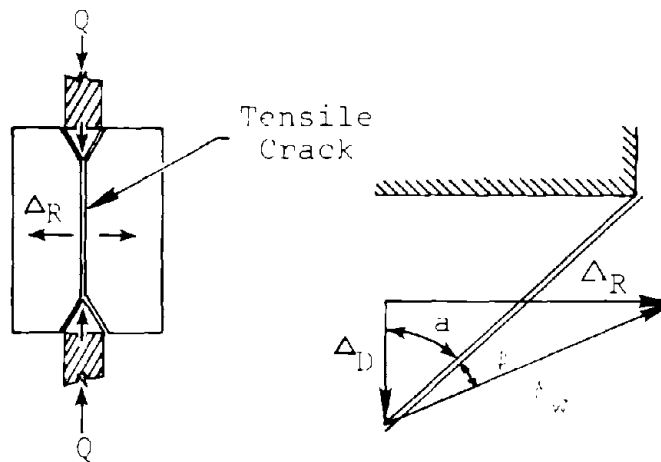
Failure mechanism of double punch test.⁽³⁸⁾
